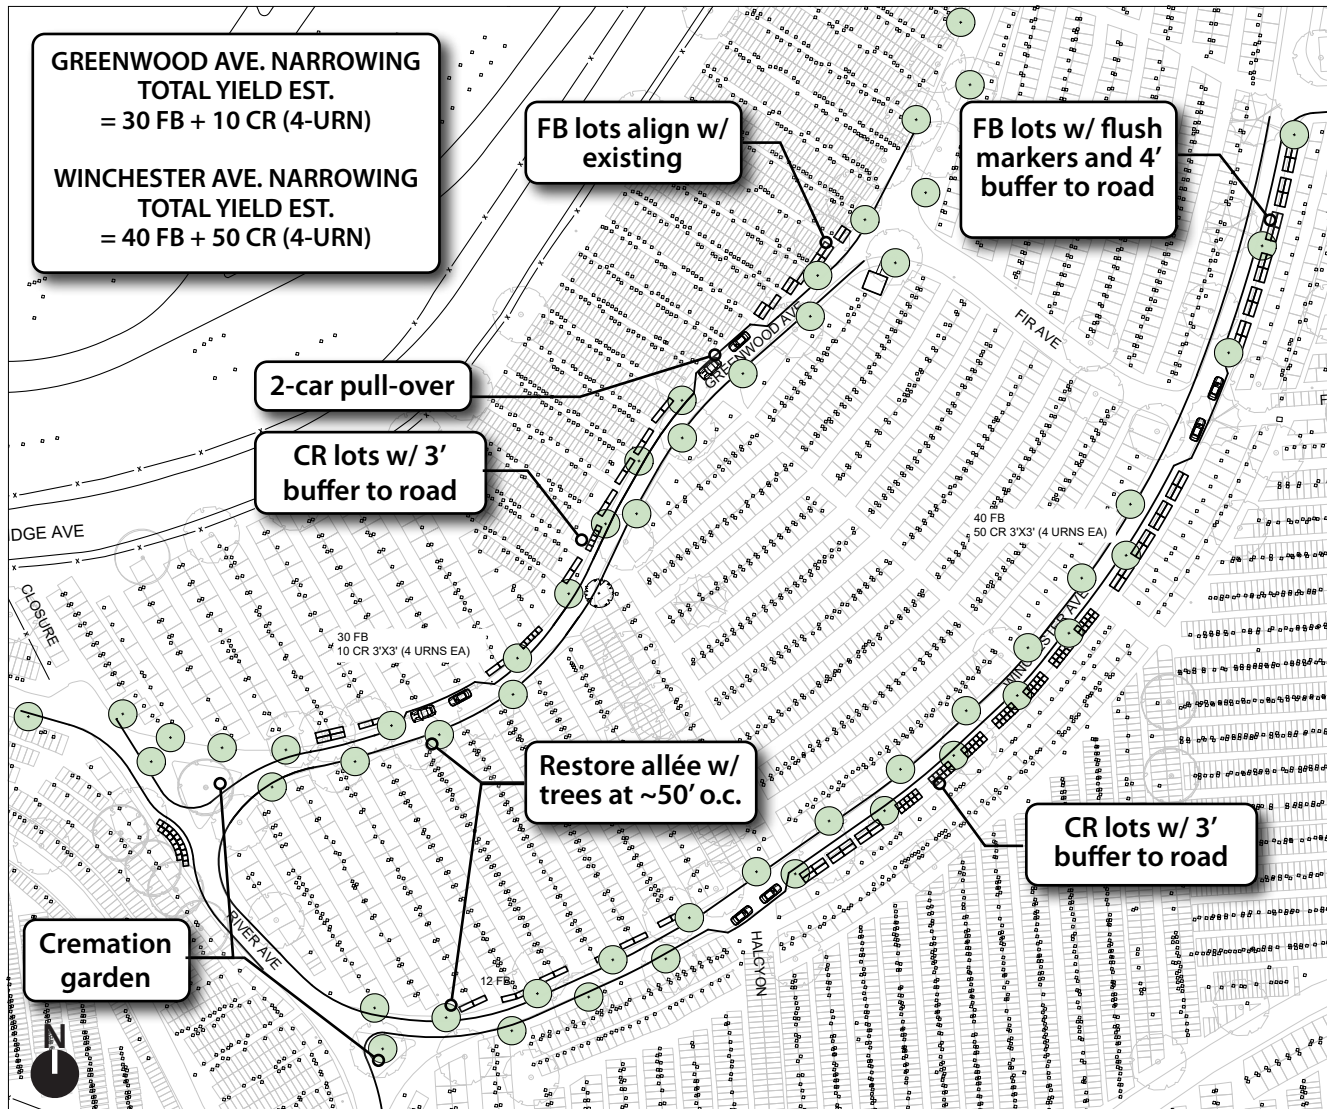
Conceptual plan study for Greenwood and Winchester Avenues narrowing including proposed lot layout and new trees.
